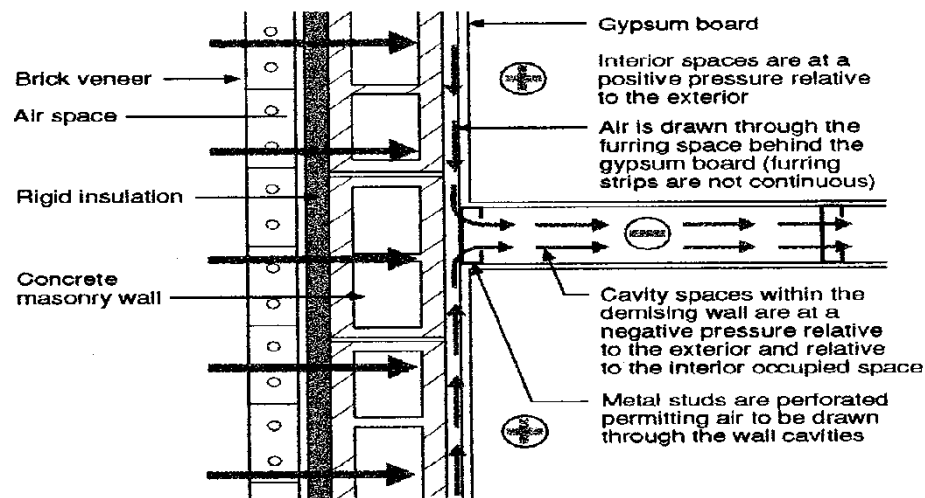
Example from section 2.3 showing connectivity between exterior masonry wall and faraway places connected through the demising walls
